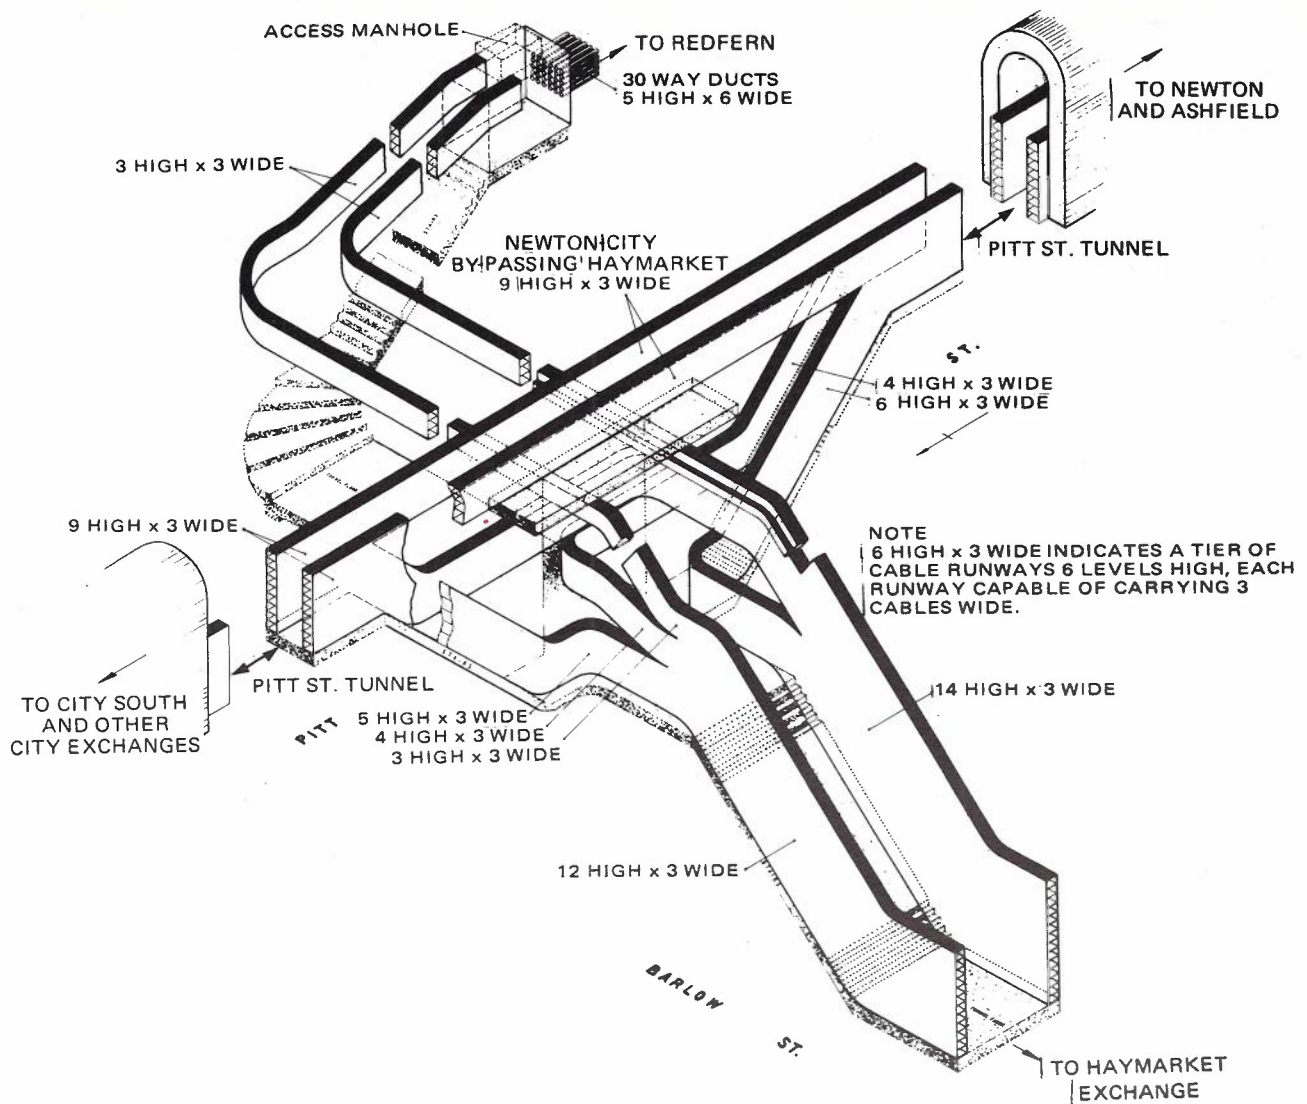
Intersection, Pitt St. Tunnel and Haymarket Exchange Break-off, Cable Runway Complex.
